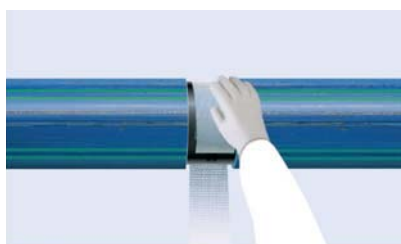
Wind the wrapping tautly around the weld area until it is flush with the protective coating
